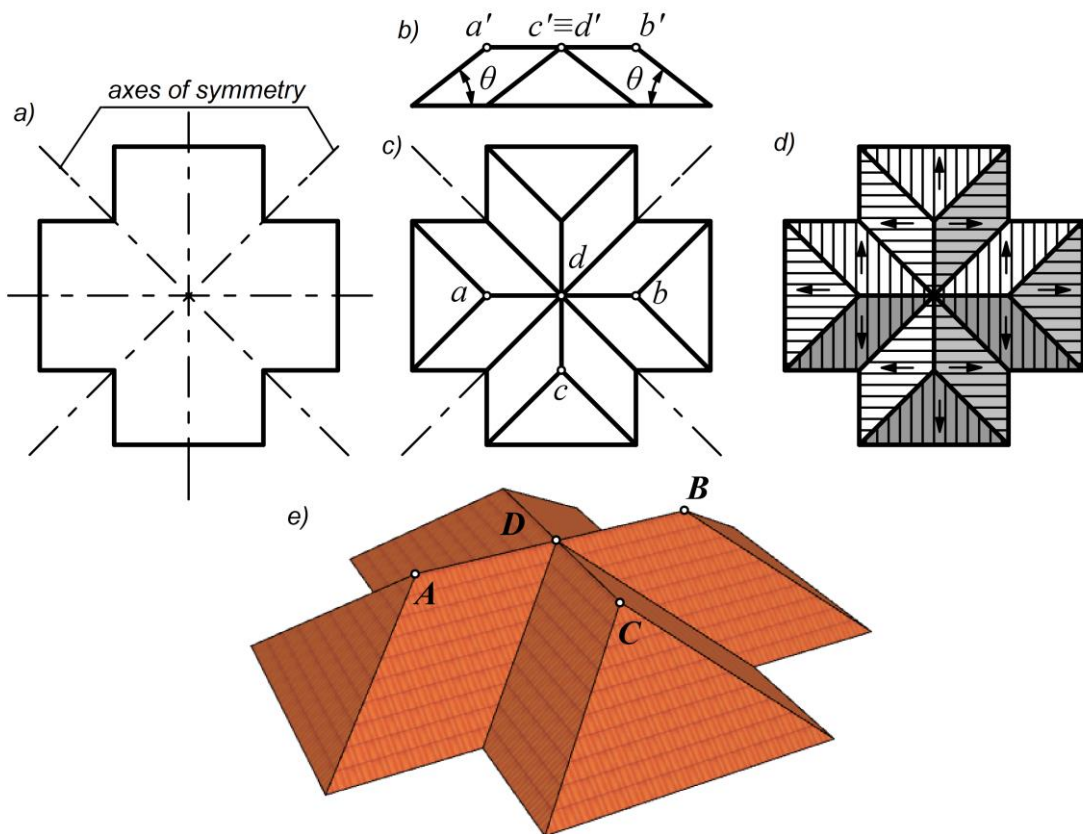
The roof of a symmetrical building: a – initial data; b and c – frontal and horizontal projections, respectively; d - top view; d - perspective
